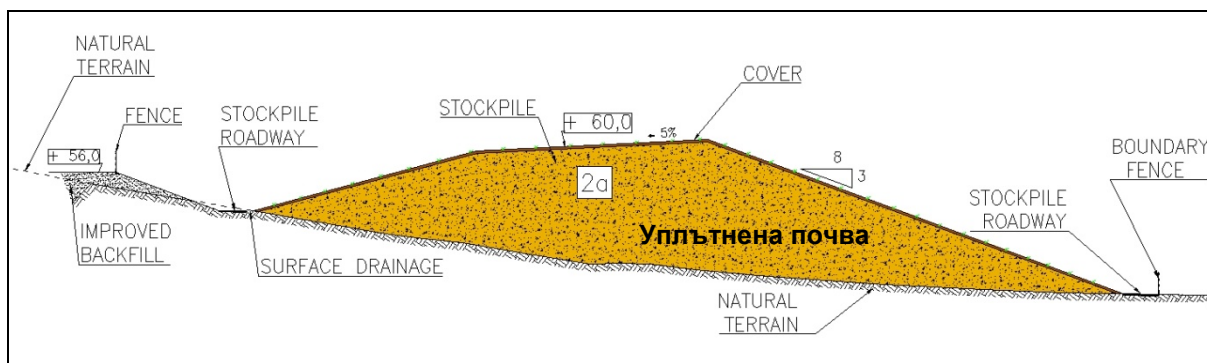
EARTH MASSES DEPOT PROJECT – CROSS SECTION
